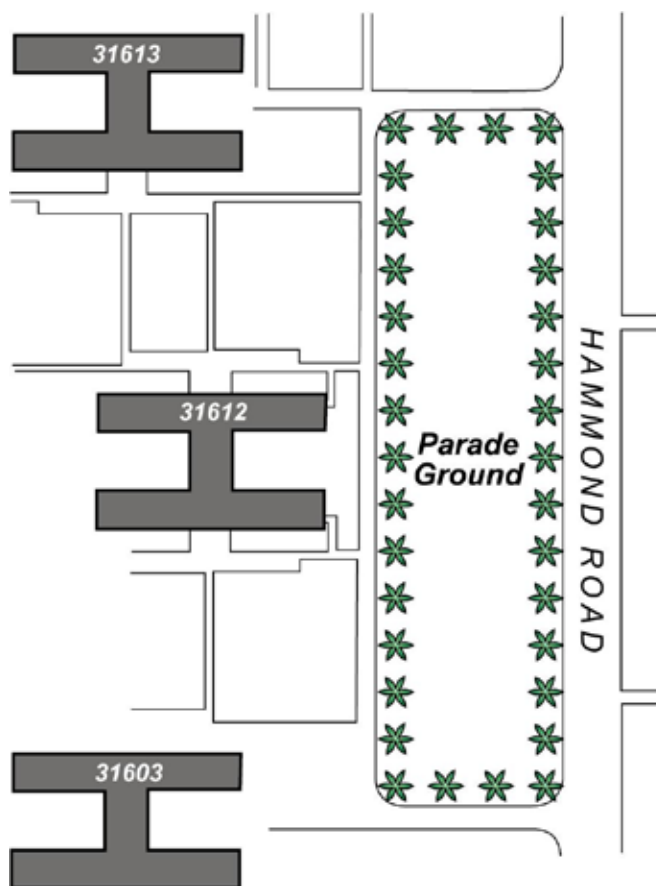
Typical layout of palms outlining the parade grounds.
